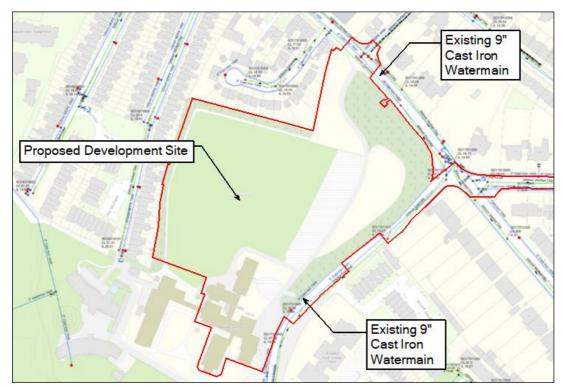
Extract from Irish Water Network Plan (Site Boundary Indicative)
